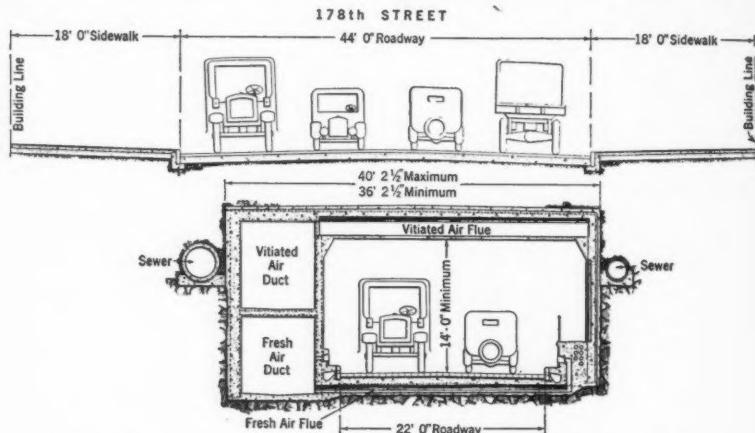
CROSS-SECTION OF TUNNEL IN WEST 178TH STREET, NEW YORK, N. Y.
